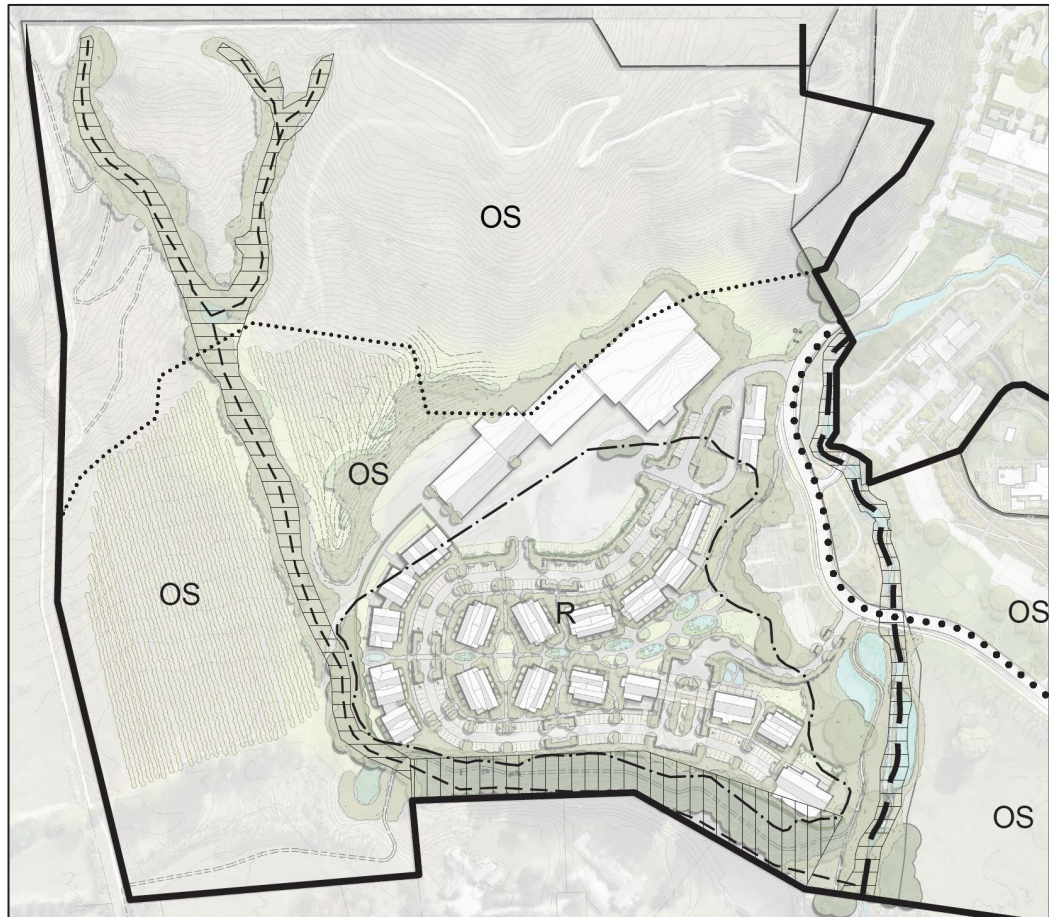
Screen Hub site plan overlaid on the Structure Plan. Source: Ayrburn Design Report Masterplan with Ayrburn Structure Plan Overlaid” Page 17 attached at Appendix 7.
